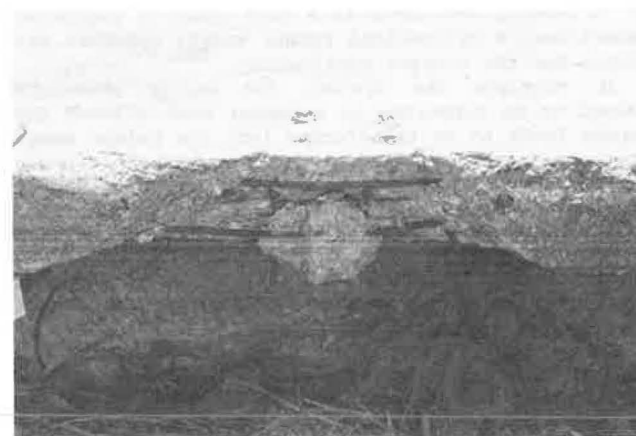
Example of worst bridge deck damage before testing.
